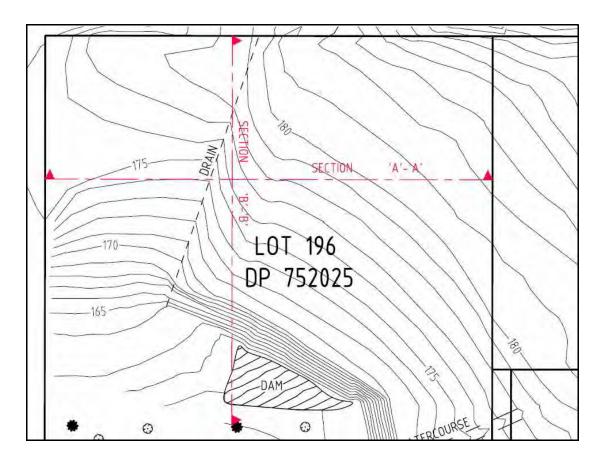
Extract from the amended final landform plan showing the location of cross sections AA and BB (refer also to Attachment 13)
